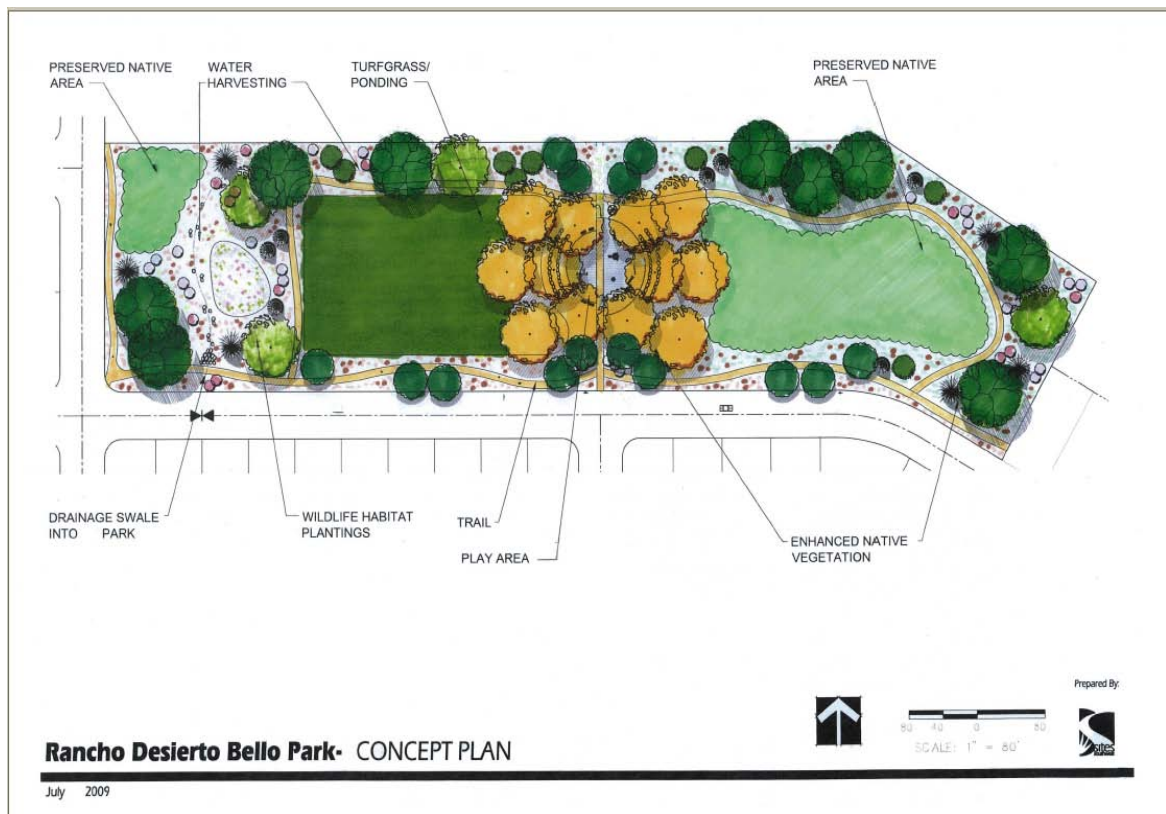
Concept Plan for Rancho Desierto Park Prepared by Sites Southwest.
